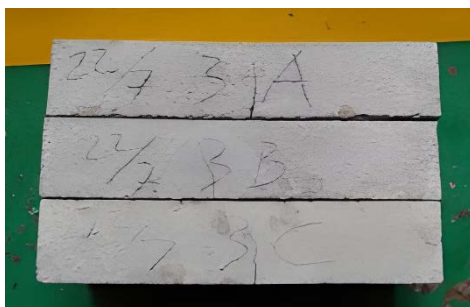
SCC RHA concrete beam crack pattern waste steel wire cut fiber
